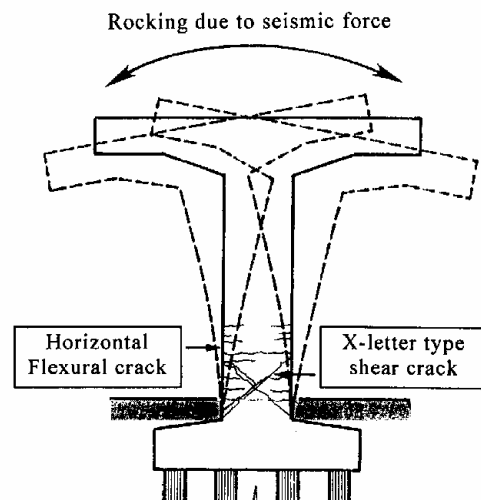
Cracking types on highway bridge pier due to rocking action.
